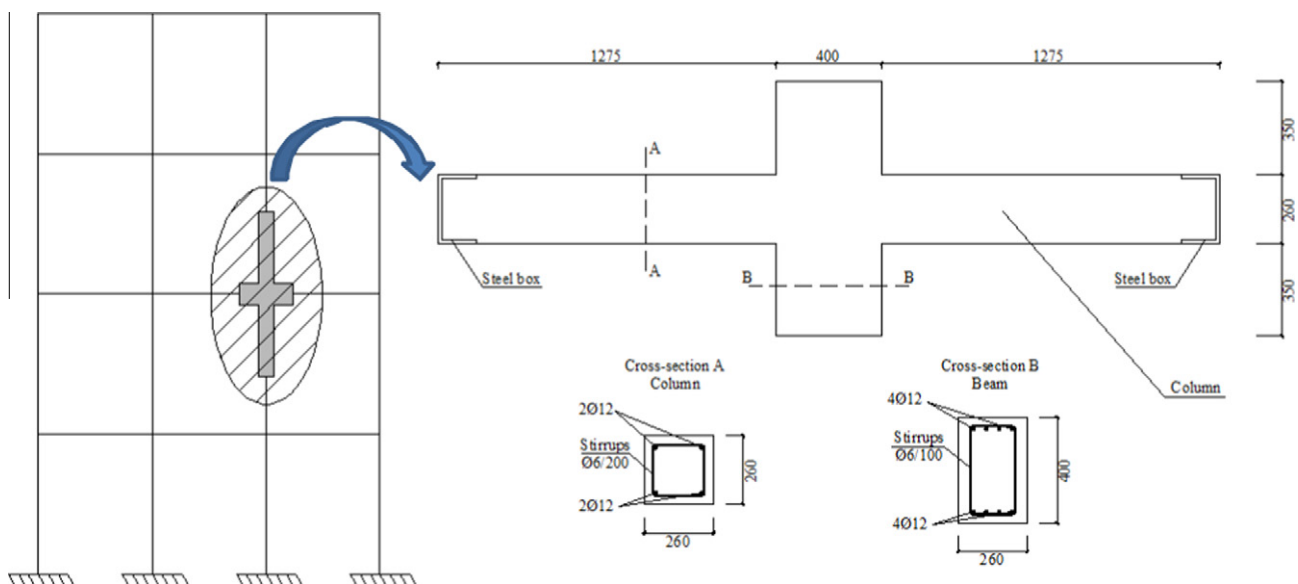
Specimen geometry and reinforcement (dimensions in mm).
